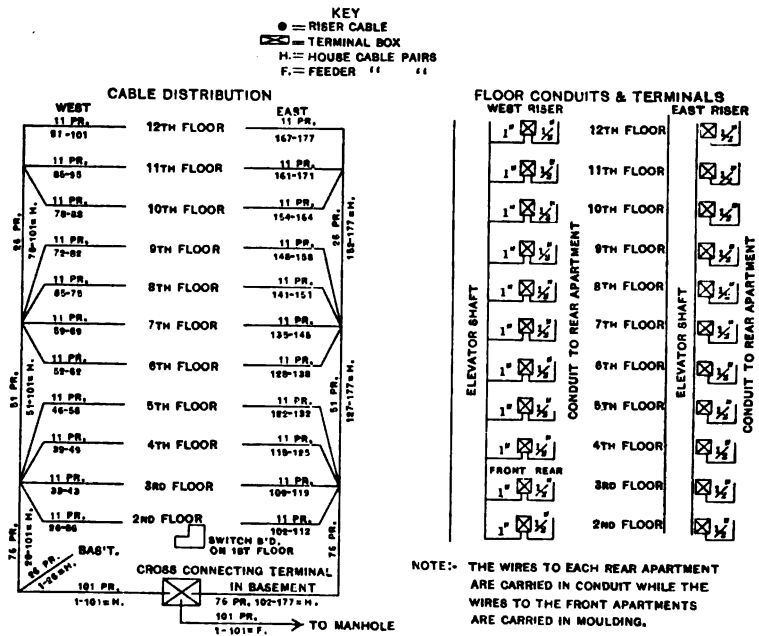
12-STORY ELEVATOR APARTMENT HOUSE.
